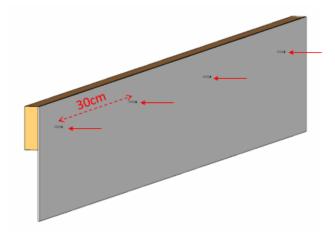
3D sketch showing the nailing of the external partition tarpaulin to the wooden beam
